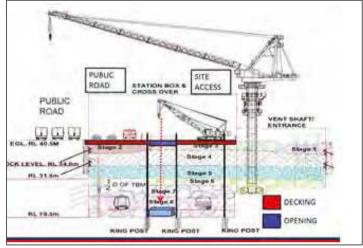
Typical cross section of the station box excavation work sequence (after Goh et al., 2015)
